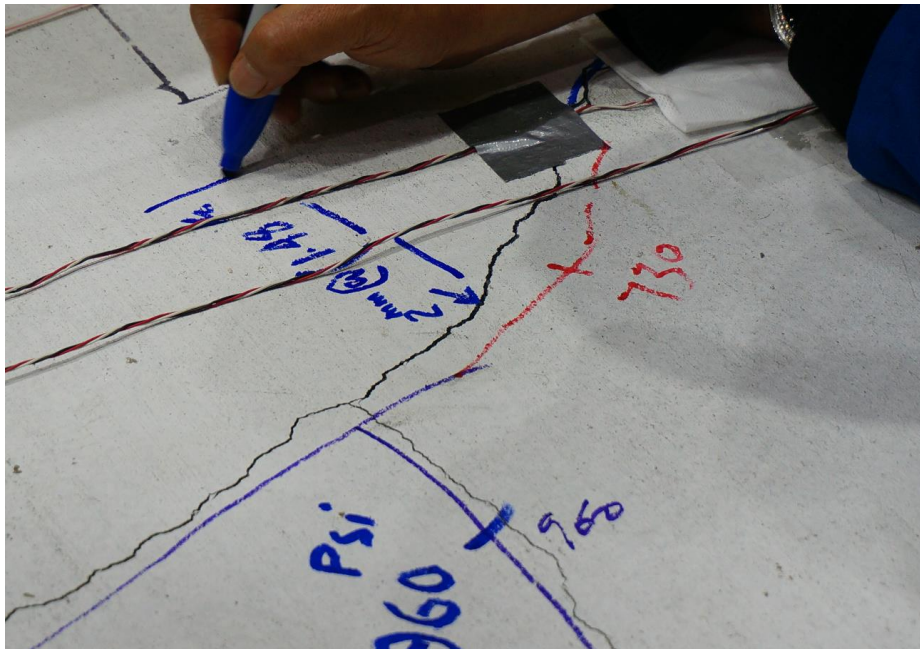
Large Cracks Widths at Central Loading Area of Sandwich Slab A
